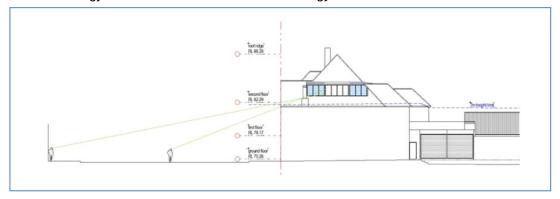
Sight distance assessment viewing eastern elevation, sightlines from middle of Argyle Street furthest southern side of Argyle Street.
